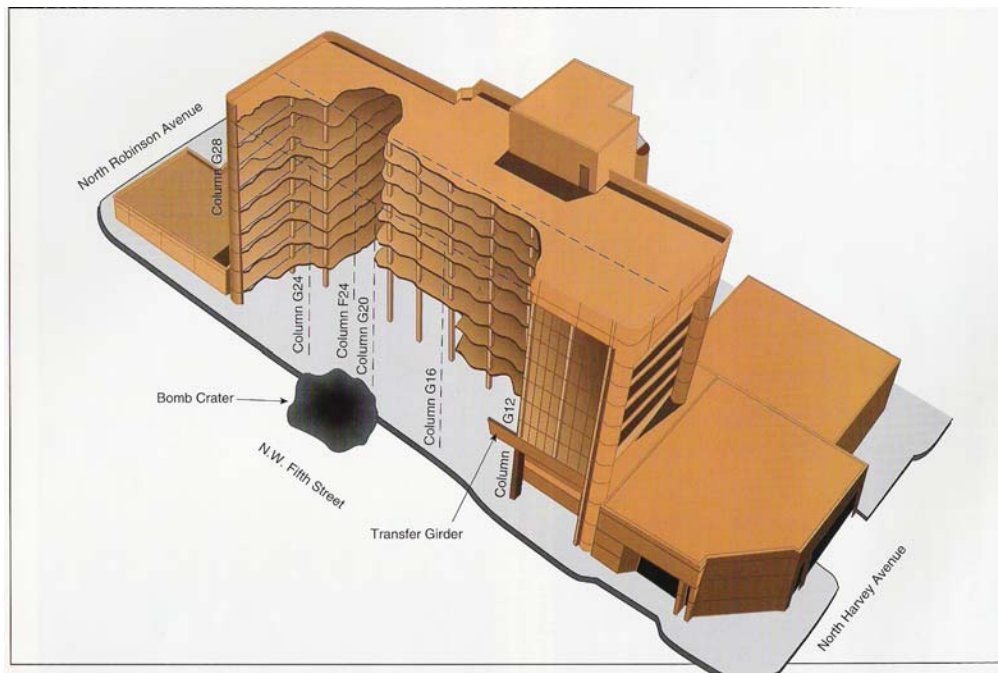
Failure Extent In Murrah Building (FEMA 1996)
